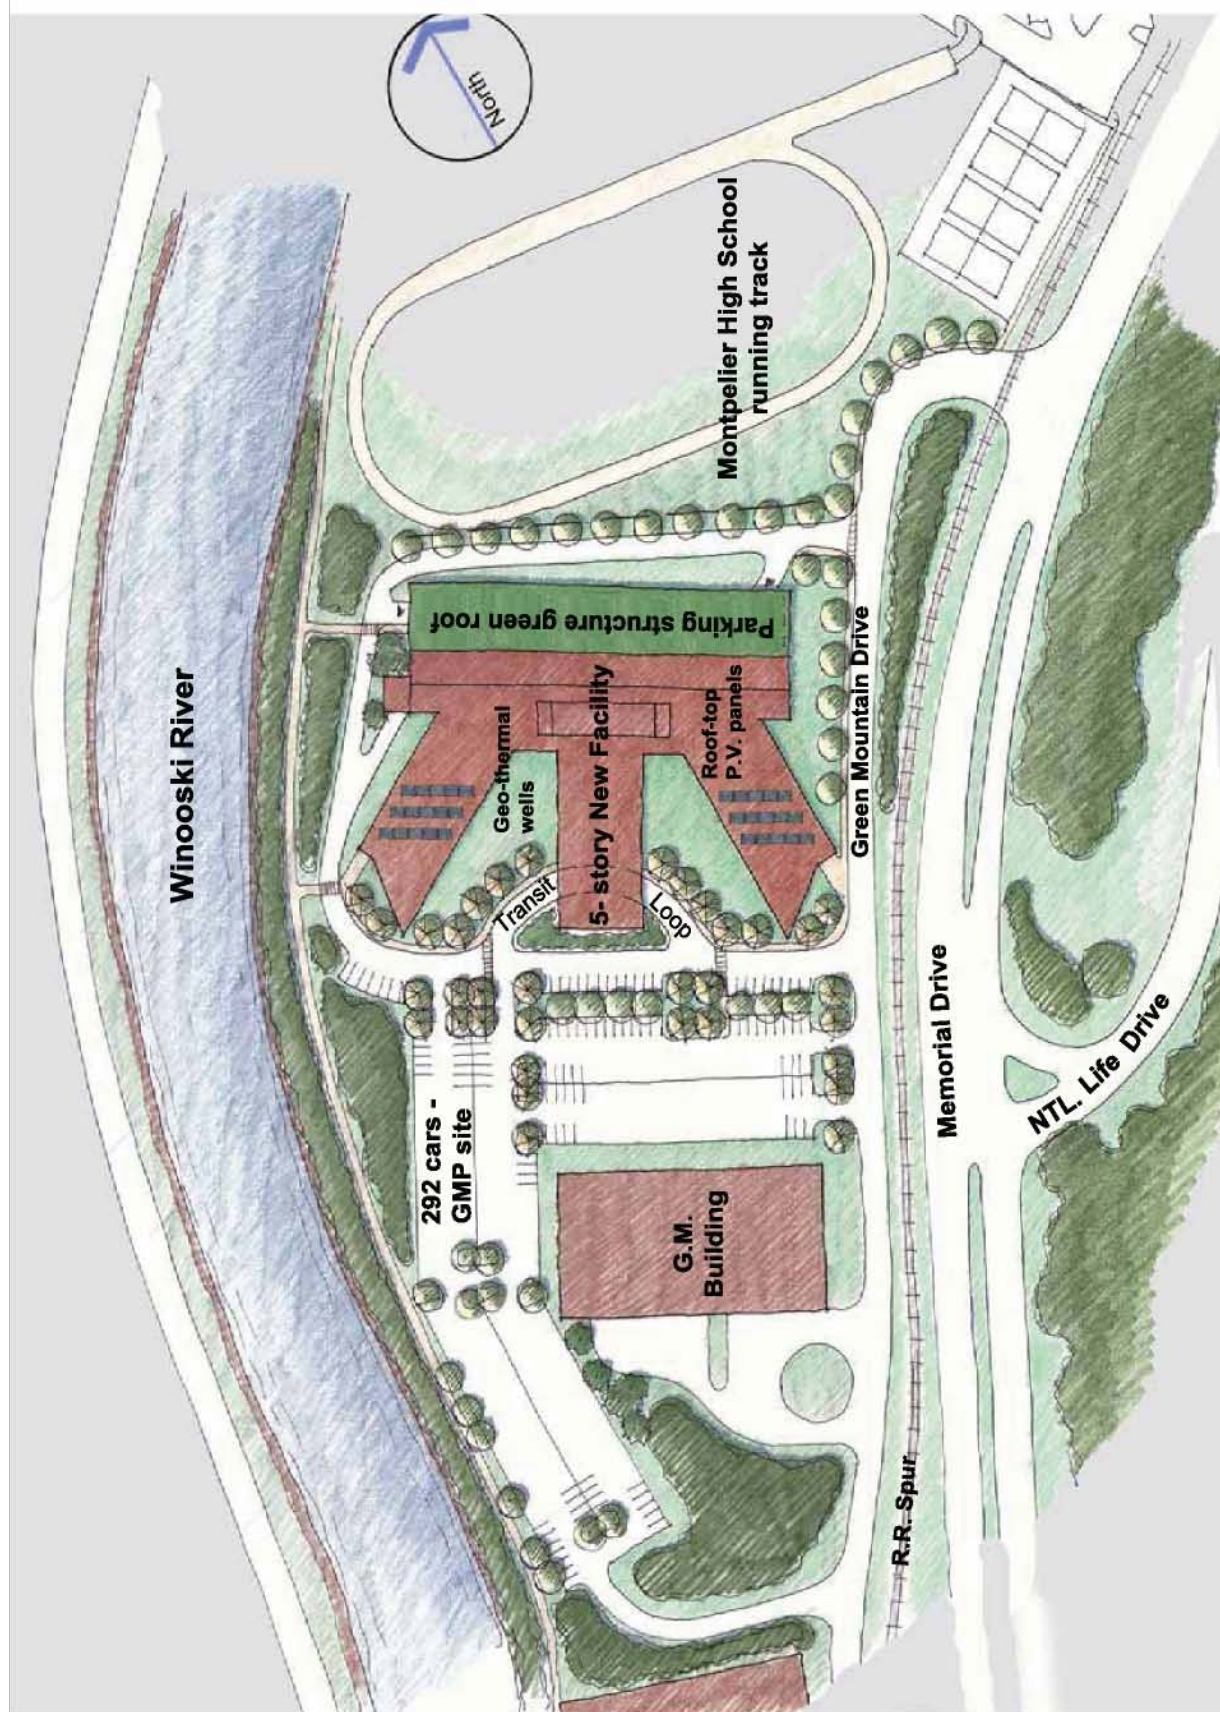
Working Model of a Layout to Replace the DOL Building in Montpelier
